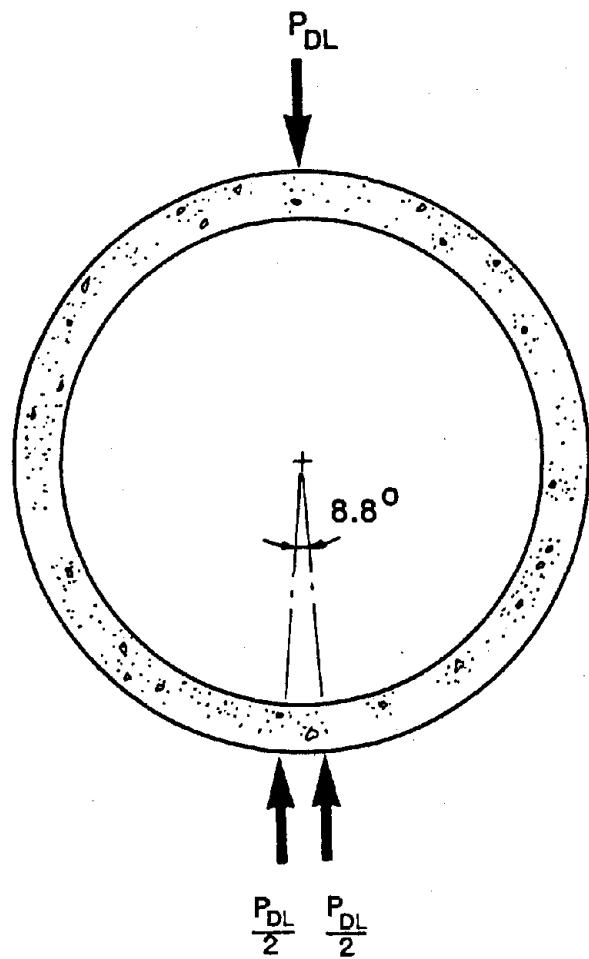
THREE EDGE BEARING LOAD CONDITION FOR PIPE
